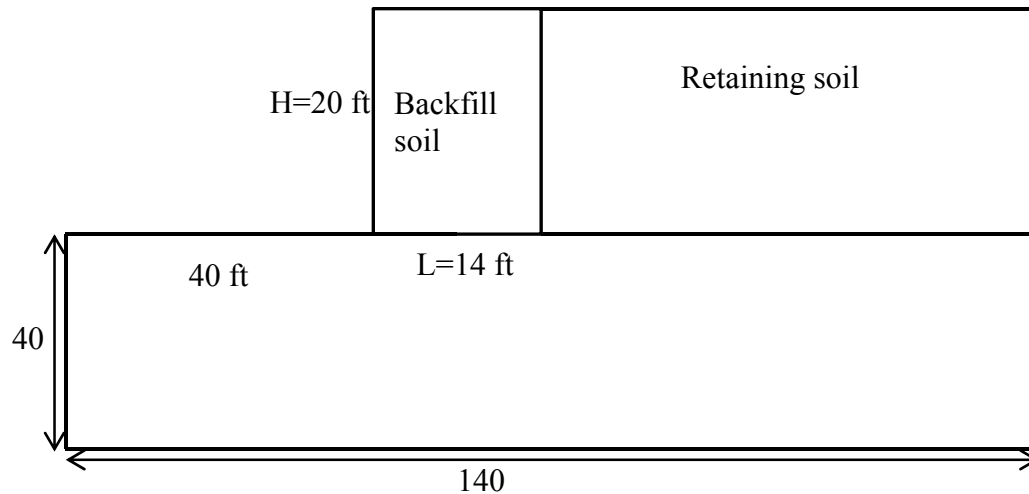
MSE Wall with 20 ft Wall Height and No Back Slope.
